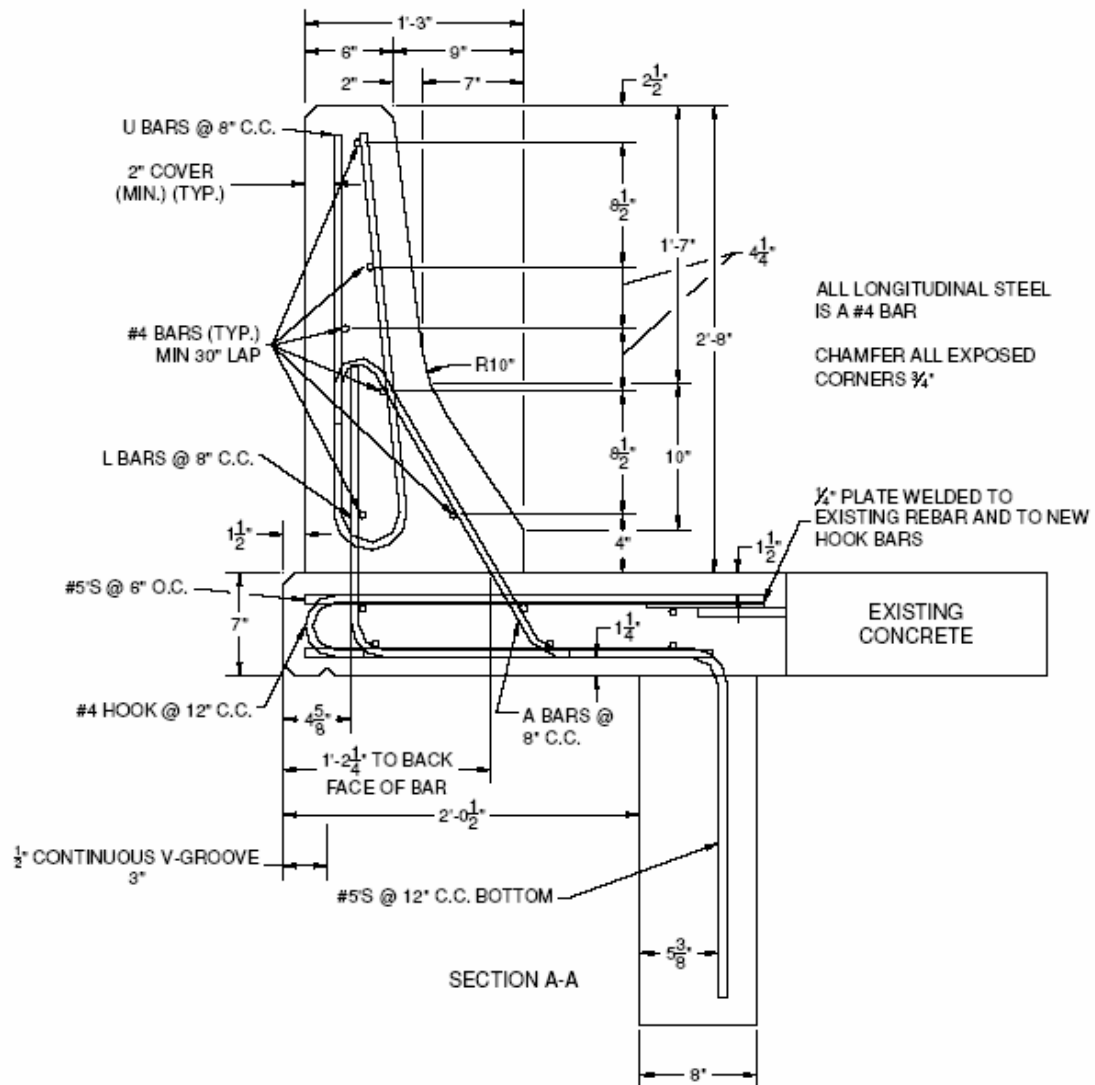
Cross-section of the Florida safety-shaped barrier with New Jersey profile (After Abu-Odeh, Bligh, & Yvonne, 2007)
